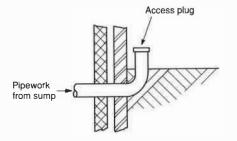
Pipework from sump capped-off with an access plug just above ground level
